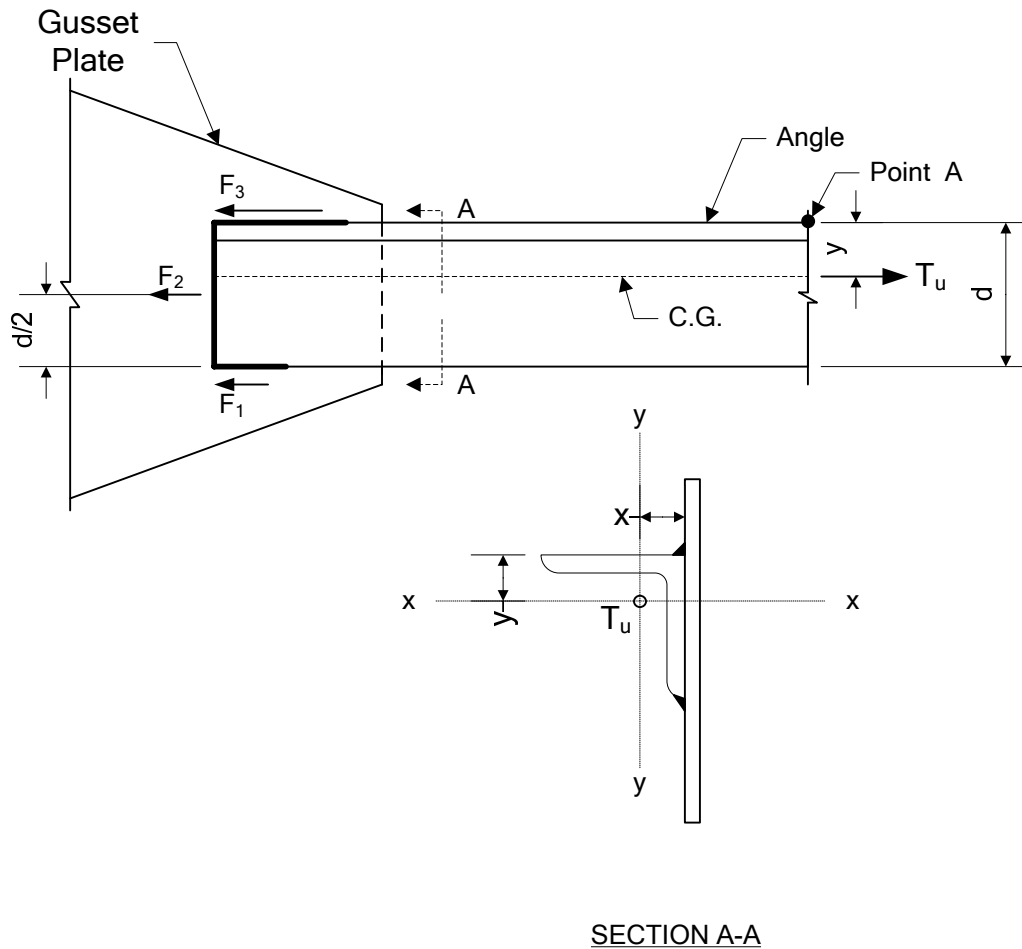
Balancing Welds on a Fillet Welded Connection
